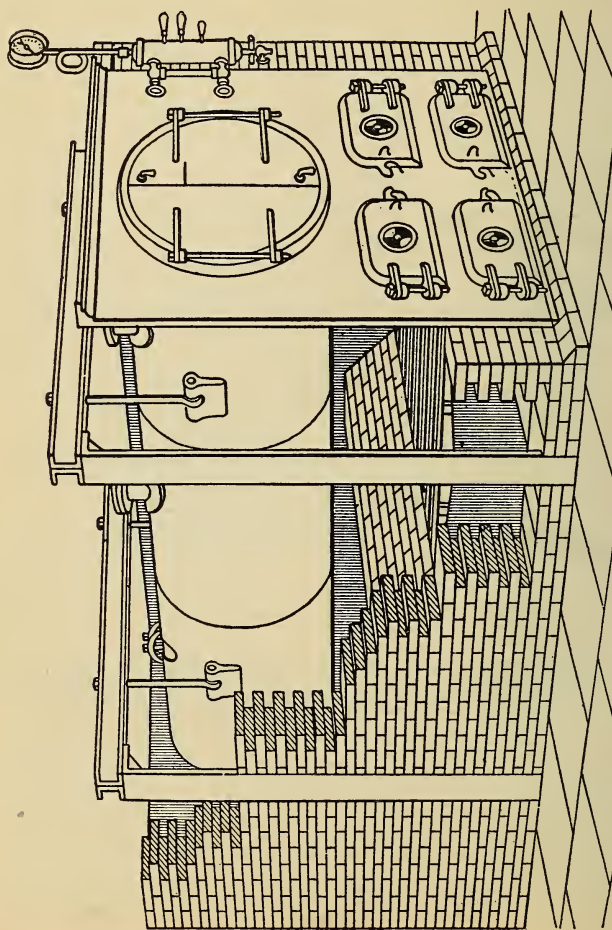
A modern setting for a horizontal return tubular boiler, with support by steel frame work.
